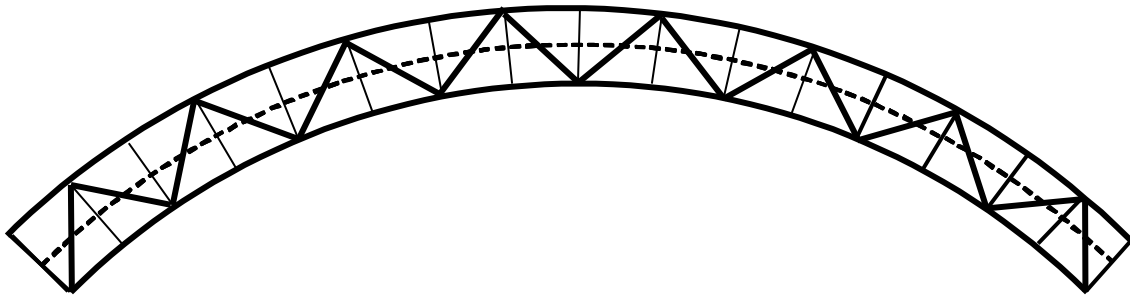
Plan View of Tub Girder with Top Flange Truss
